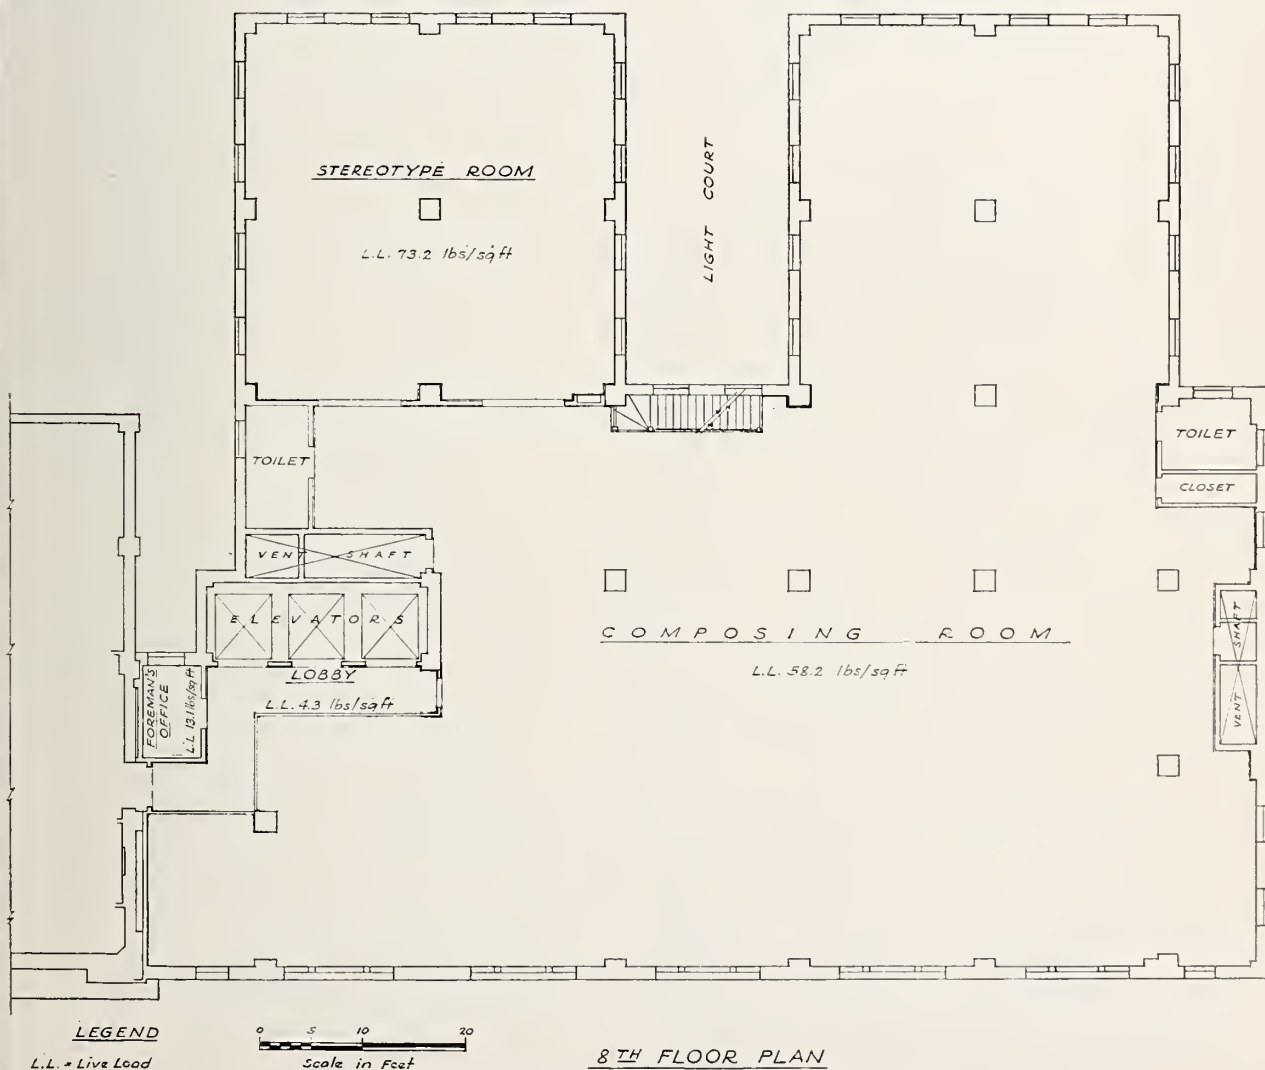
Eighth-floor plan, newspaper plant, Washington, D. C.
